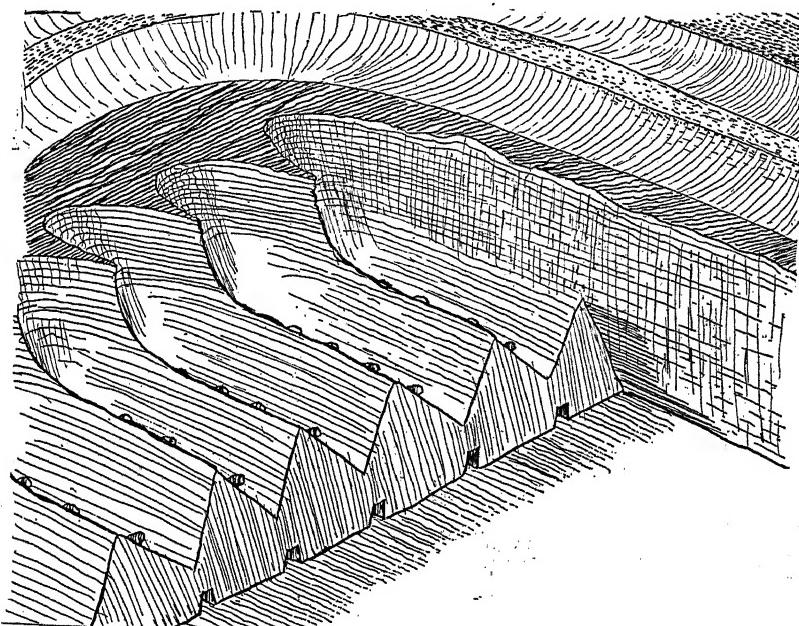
APPEARANCE OF A PIT IN WHICH A MECHANICAL CUTTER WAS USED TO MINE AND LOAD THE COAL.
